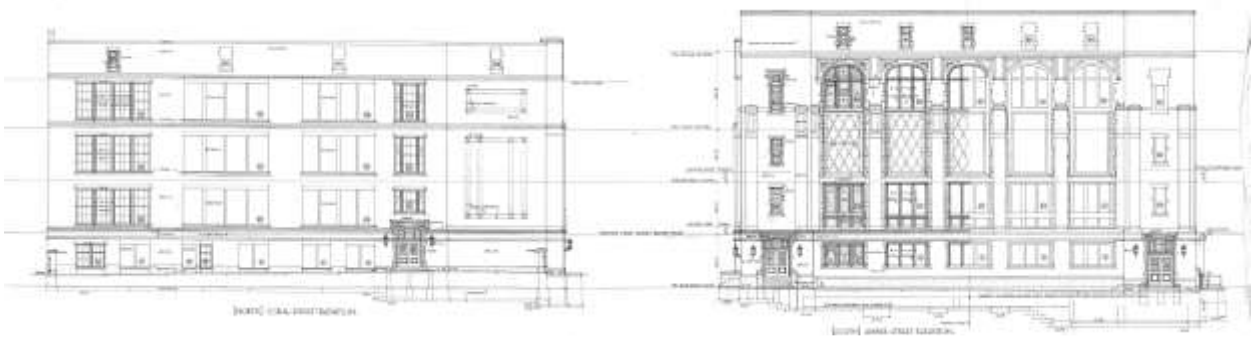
Side Building Elevation Views from Original Architectural Drawing at Kensington H.S.
